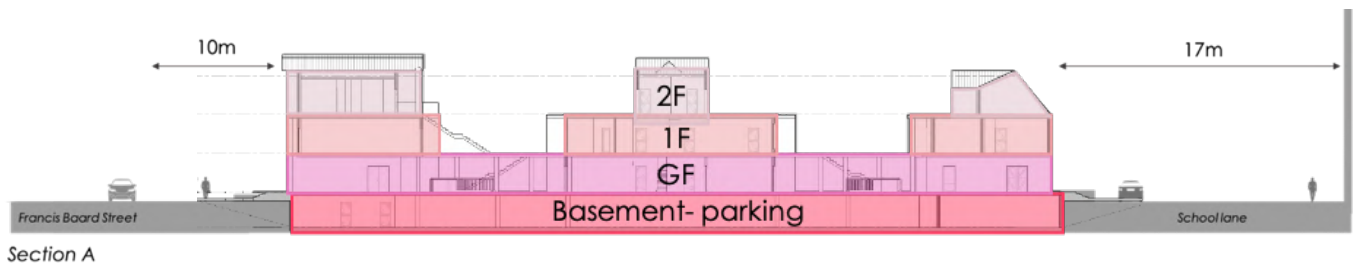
Indicative section highlighting wide sidewalk on Francis Baard Street, and dead-end on School Lane for activities to spill out (Author, 2021).
